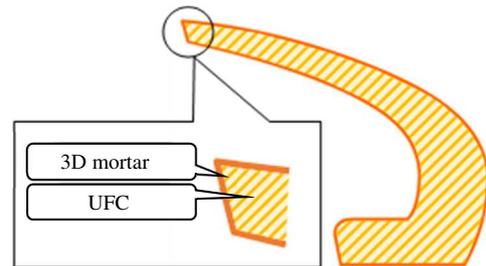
Layout of 3D mortar and UFC (Fully filled)
